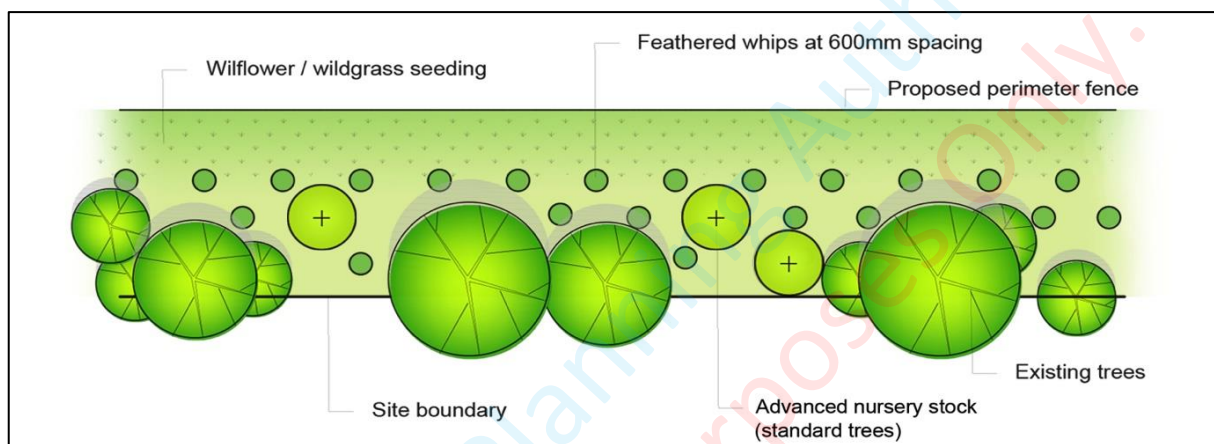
Hedgerow Type 1: indicative boundary planting detail showing the approach to inter-planting and under-planting of existing hedgerows (where consolidation is needed).
